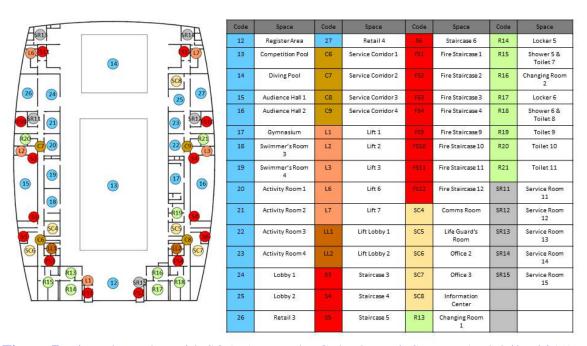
First Floor Plan with SOA. (Drawn by Goh Zhen Yi. Source: Archdaily, 2019).
